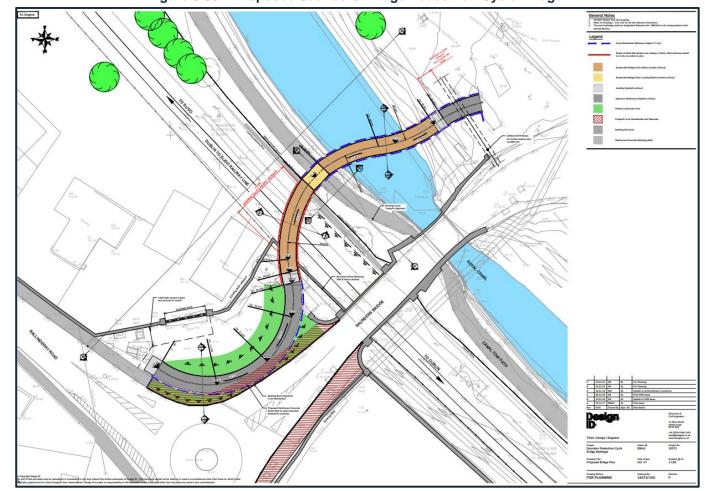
Proposed Saunders Bridge Pedestrian Cycle Bridge
